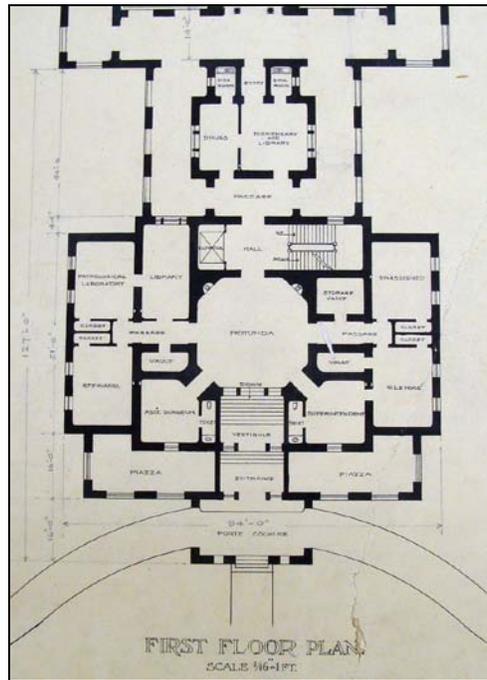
Excerpt of "Proposed Battle Mountain Sanitarium First Floor Plan" showing Administration Building, c. 1902
